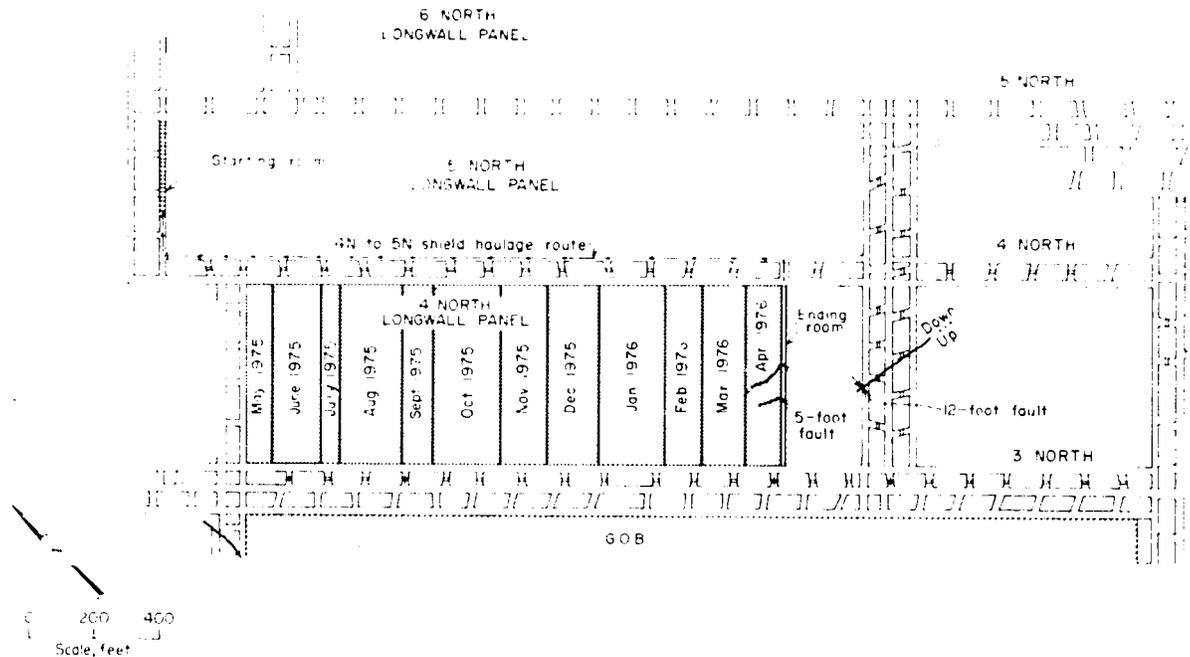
Longwall shield support test site at York Canyon underground coal mine.
